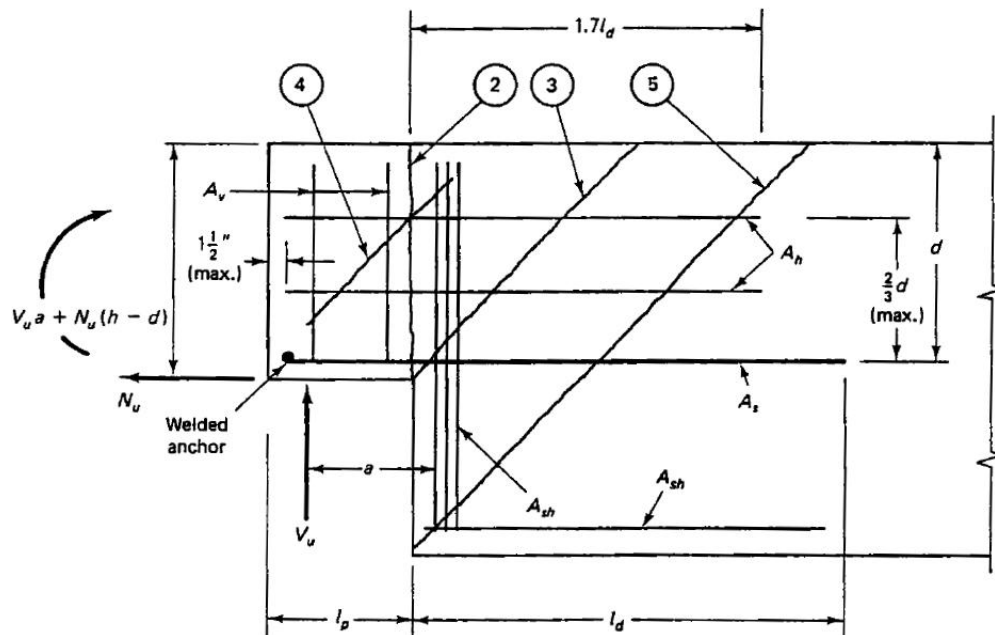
Cracking and reinforcement in dapped-end beam connections.
